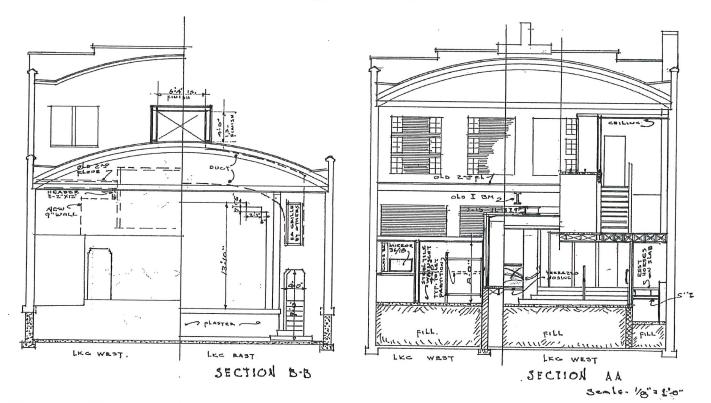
Interior projection booth elevation, looking south (original renovation plans)
